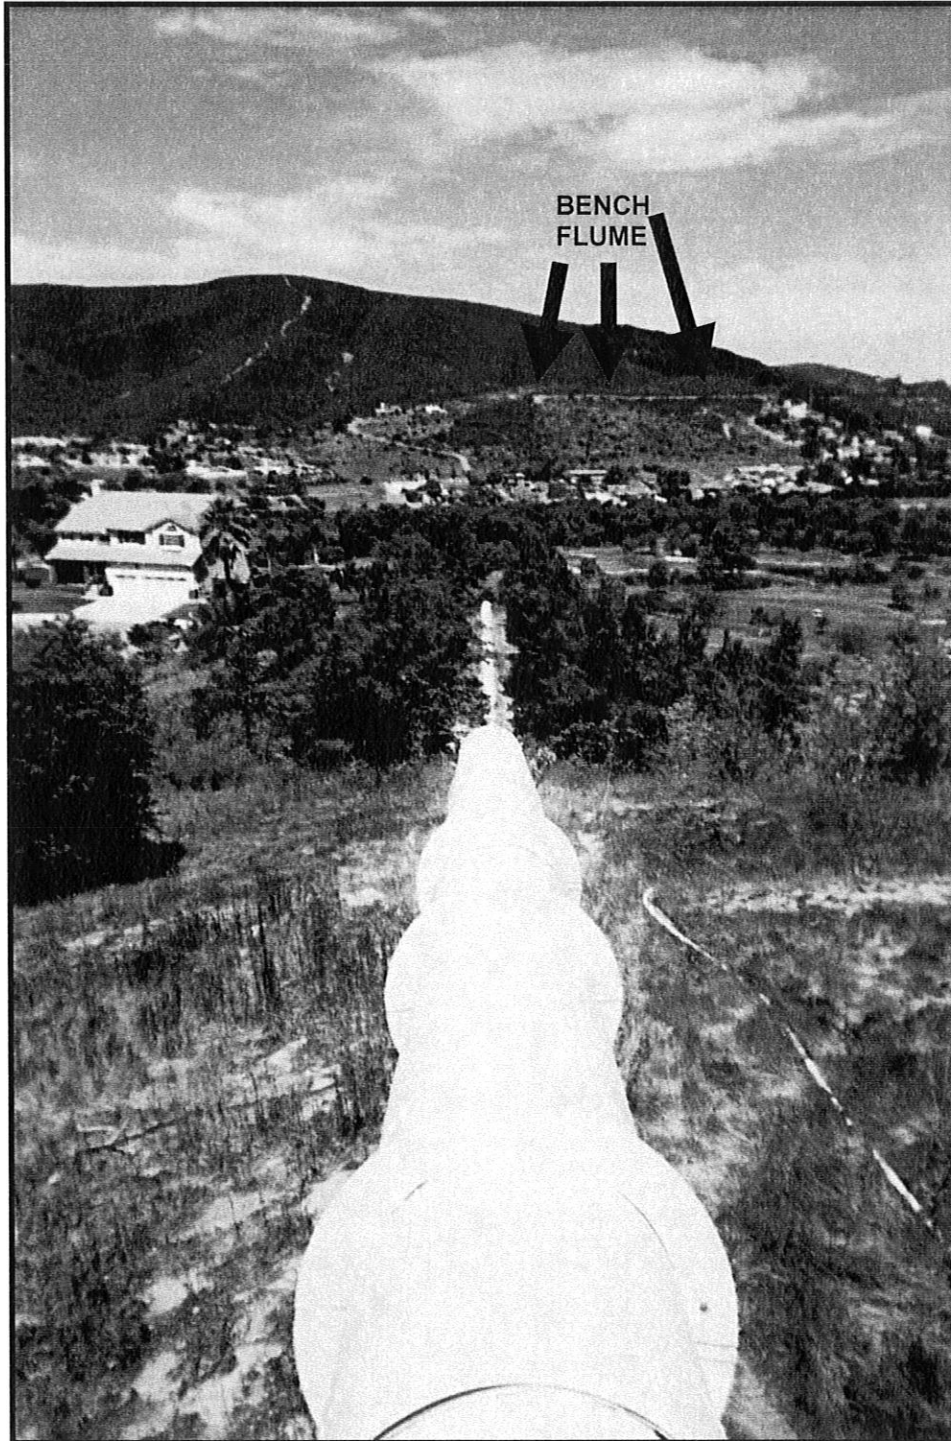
Above ground steel pipe portion of the Twin Oaks Siphon in foreground. Twin Oaks Bench Flume along the ridge in the background.
